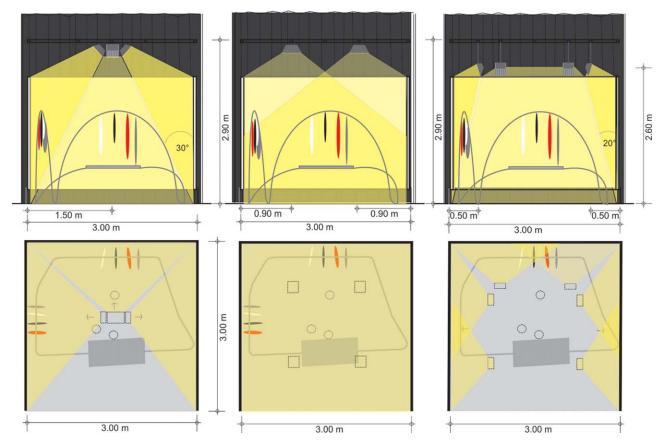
Layout and plan view of the luminaires arrangement and light distribution in frontal, overhead, and wallwasher lighting
